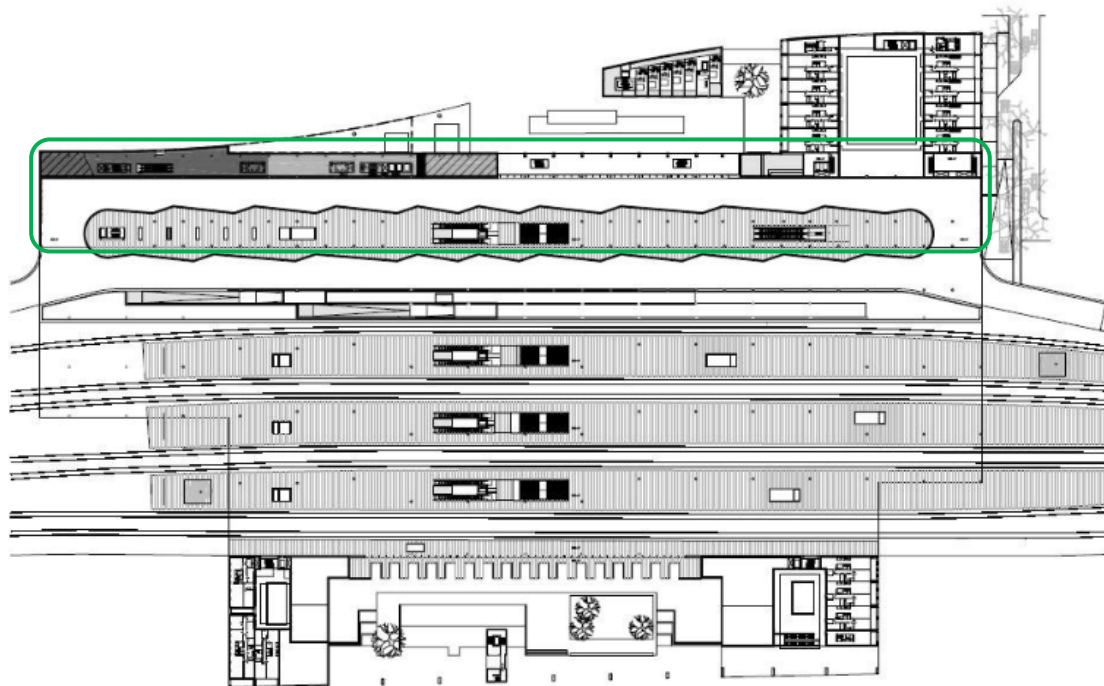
Plan view level 1-2 (□ bus terminal)
